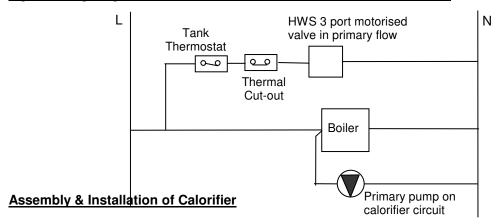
Wiring Diagram for Thermostat, Thermal Cut-Out & Motorised Valve
